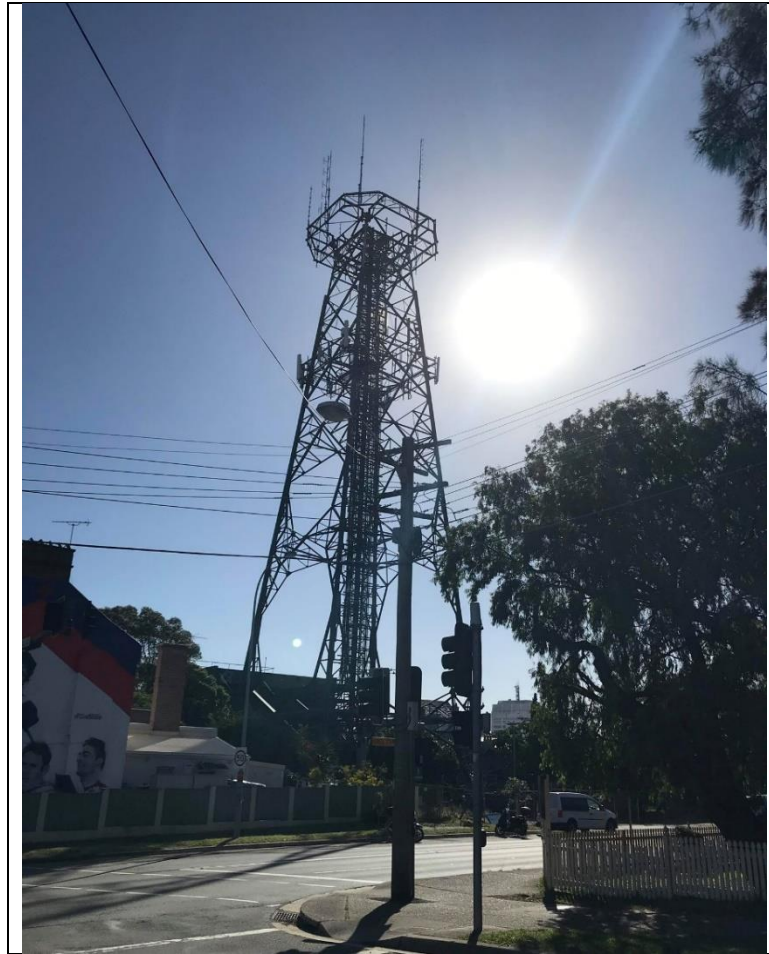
Subject site viewed from the corner of Council Street and Birrell Street
